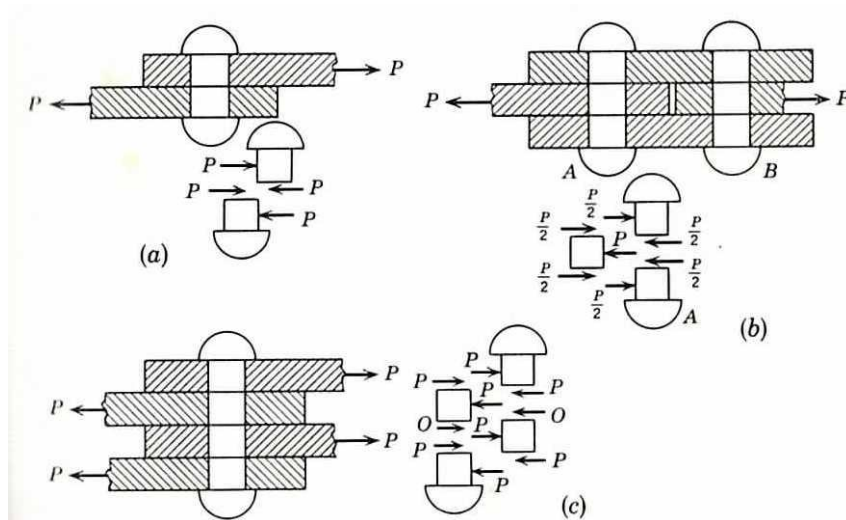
types of riveted connections: a) Lap joint, rivet in single shear, b) Butt joint, rivet in double shear, c) Rivet in multiple shear (Bresler et al. 1960).
